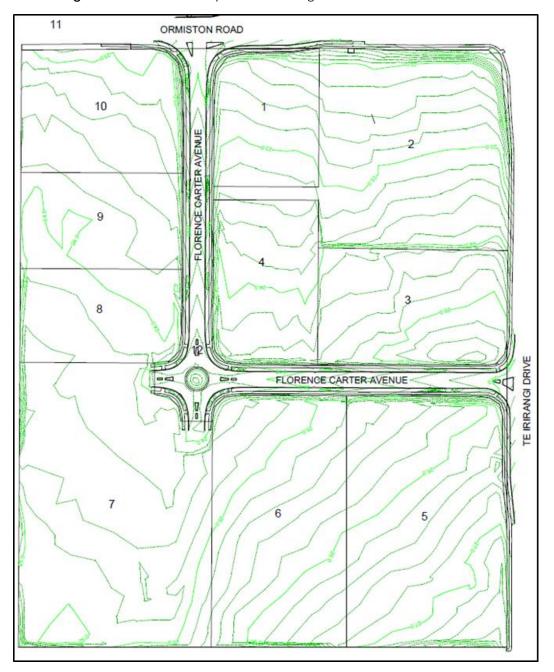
As-Built Contours and Lot / Road Layout (Source: Candor3)
